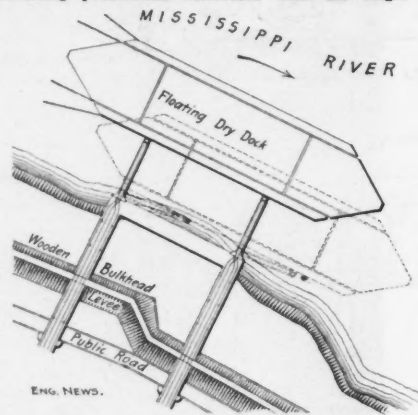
General Plan of Location of 15,000-ton Floating Dry Dock at Algiers, La.
